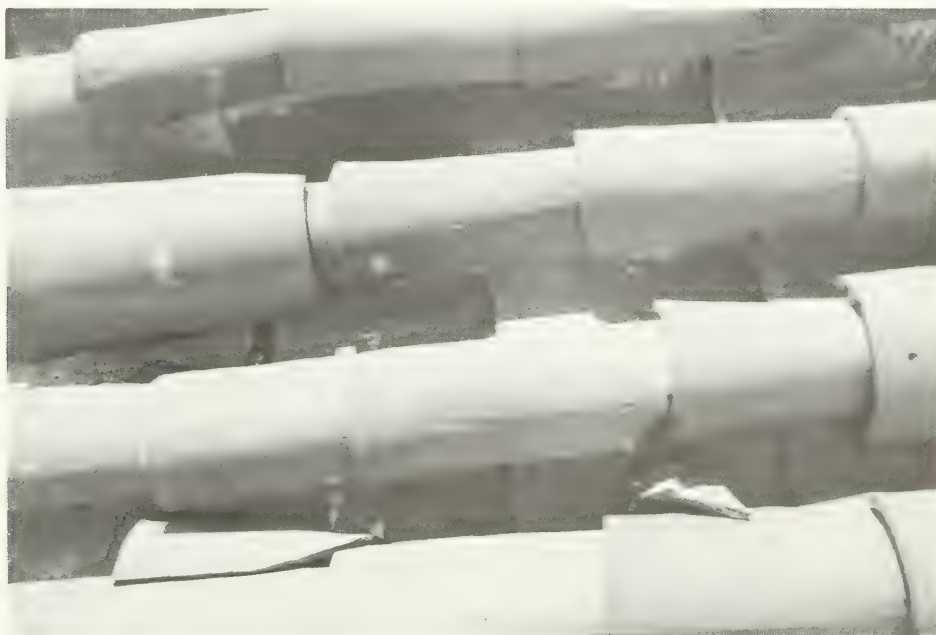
Roof tile detail, Main House at west side of observation tower. Shows broken tile, exposed bedding mortar and temporary modern tile. Photo by R.L. Carper, April 1989.
